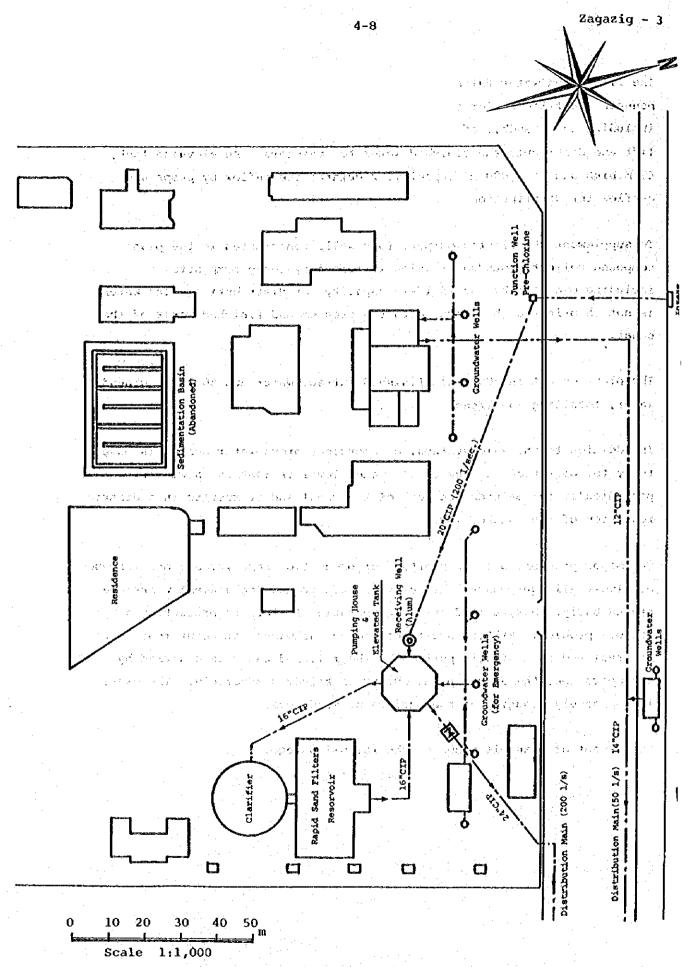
GENERAL PLAN OF ZAGAZIG PLANT
